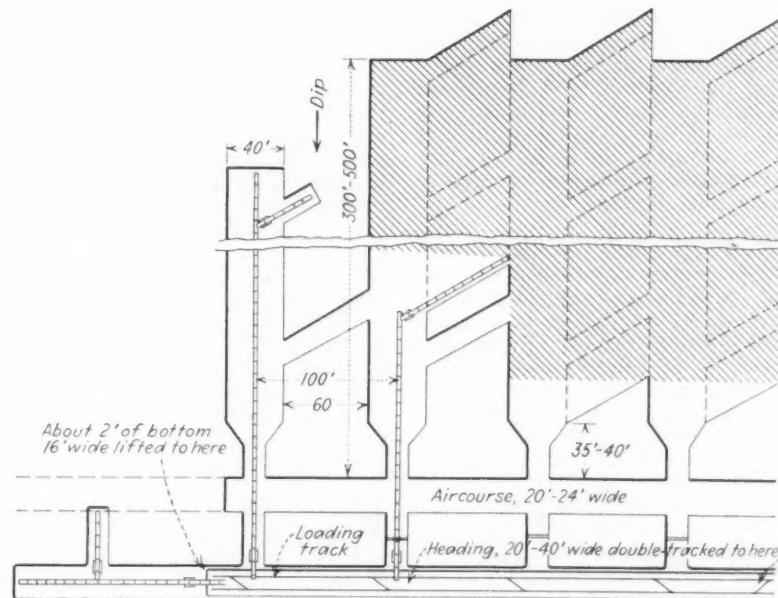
General plan for advancing entries and rooms and robbing pillars at Peerless No. 3 mine
